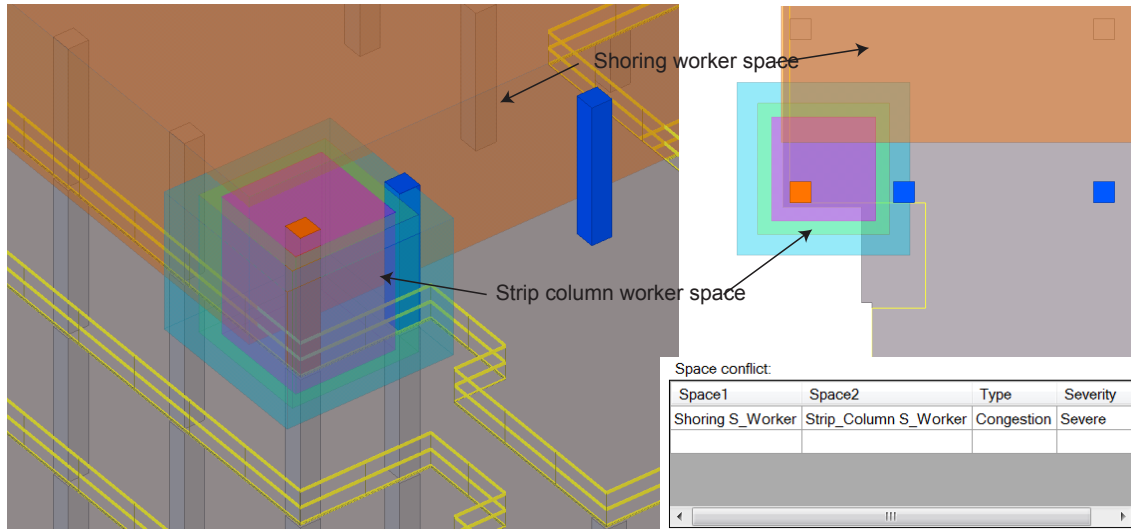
Workspace congestion identified between shoring and stripping column activity in BIM (Left: 3D view, Right: Top plan view)
